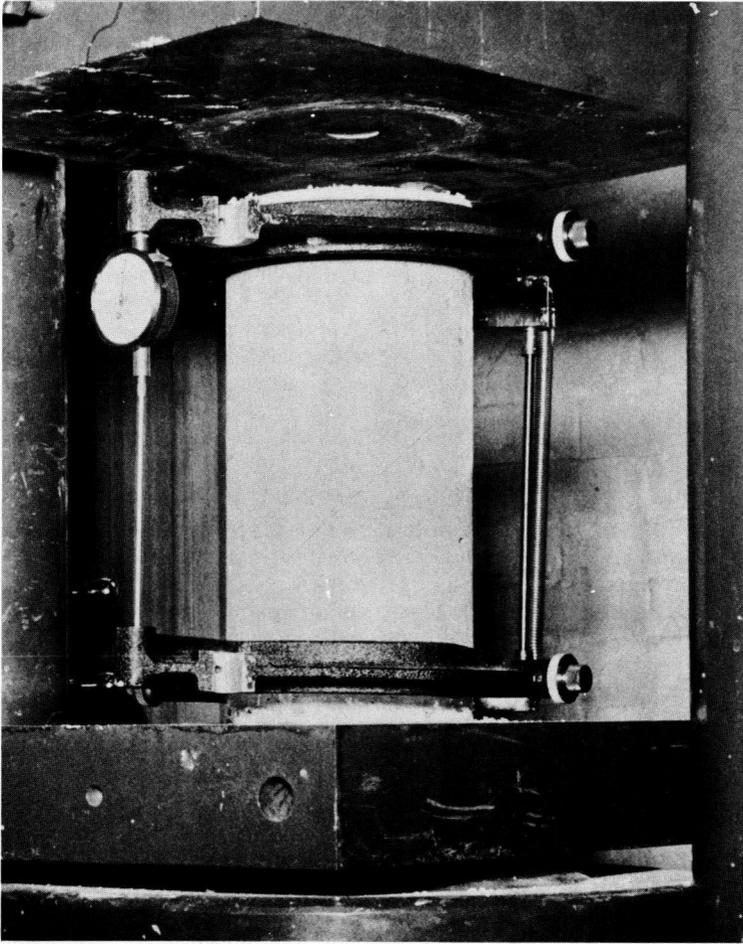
Compression cylinder with Riehle compensating compressometer in place in testing machine.
